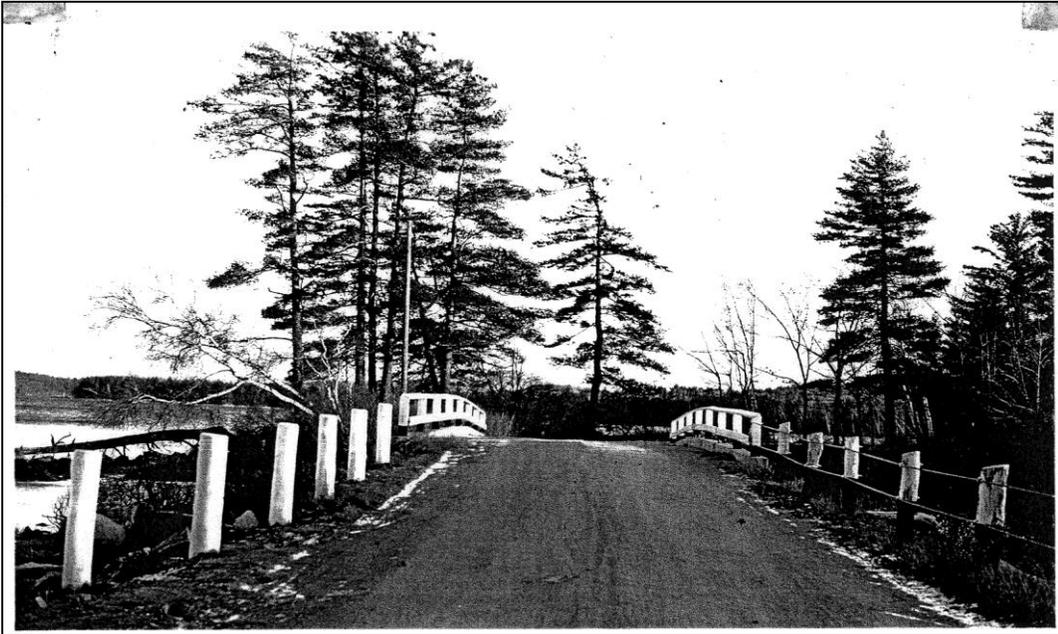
Photo of Center Harbor Bridge 080/040, December 11, 1941, showing Center Harbor (north) approach looking south toward New Hampton. Note original wood railings and post and cable guardrails along approaches (NHHD Bridge Card 1941).
